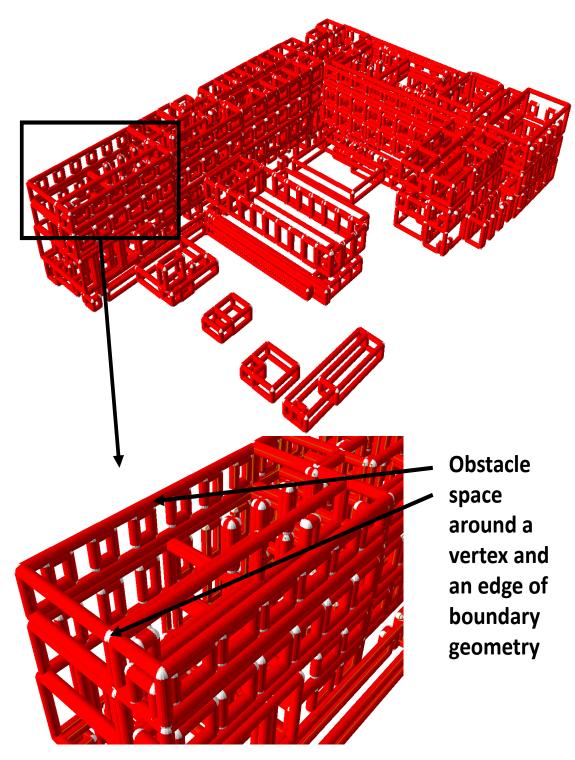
The edges geometries of boundary surfaces are extruded.
